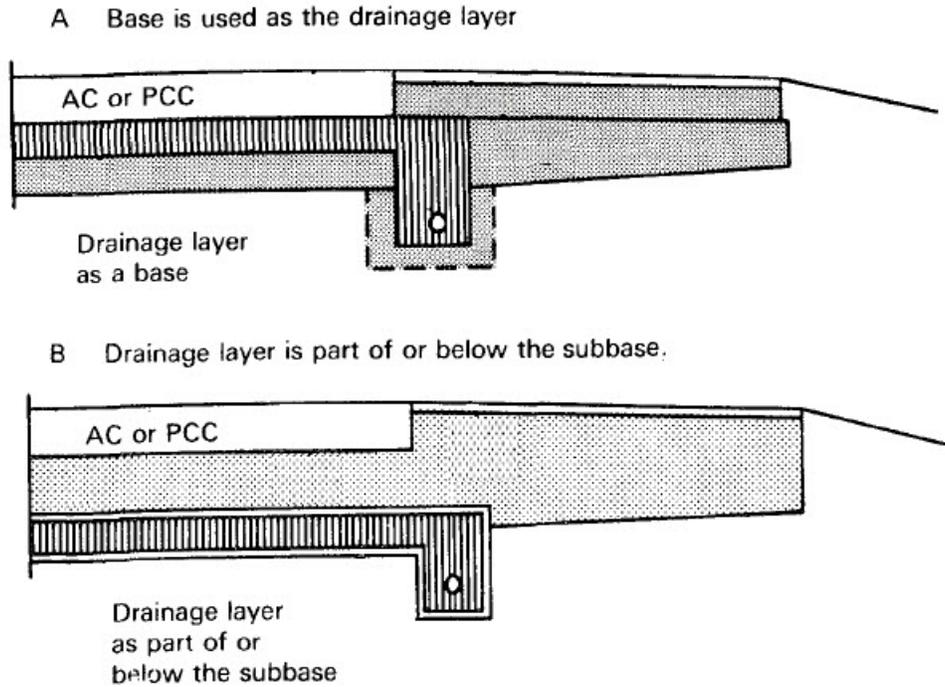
Typical permeable base pavement sections: (a) base used as drainage layer (b) drainage layer is part of or below the subbase (from AASHTO, 1993).
